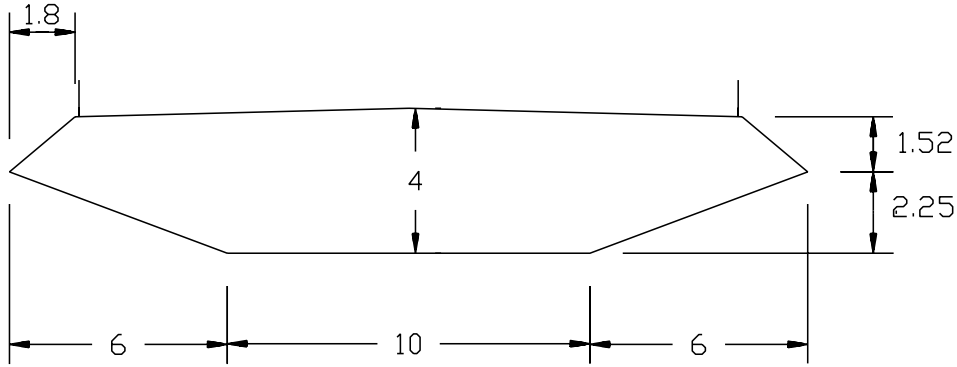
Sketch of the deck cross-section of the Högå Kusten Bridge (dimensions in meters).
